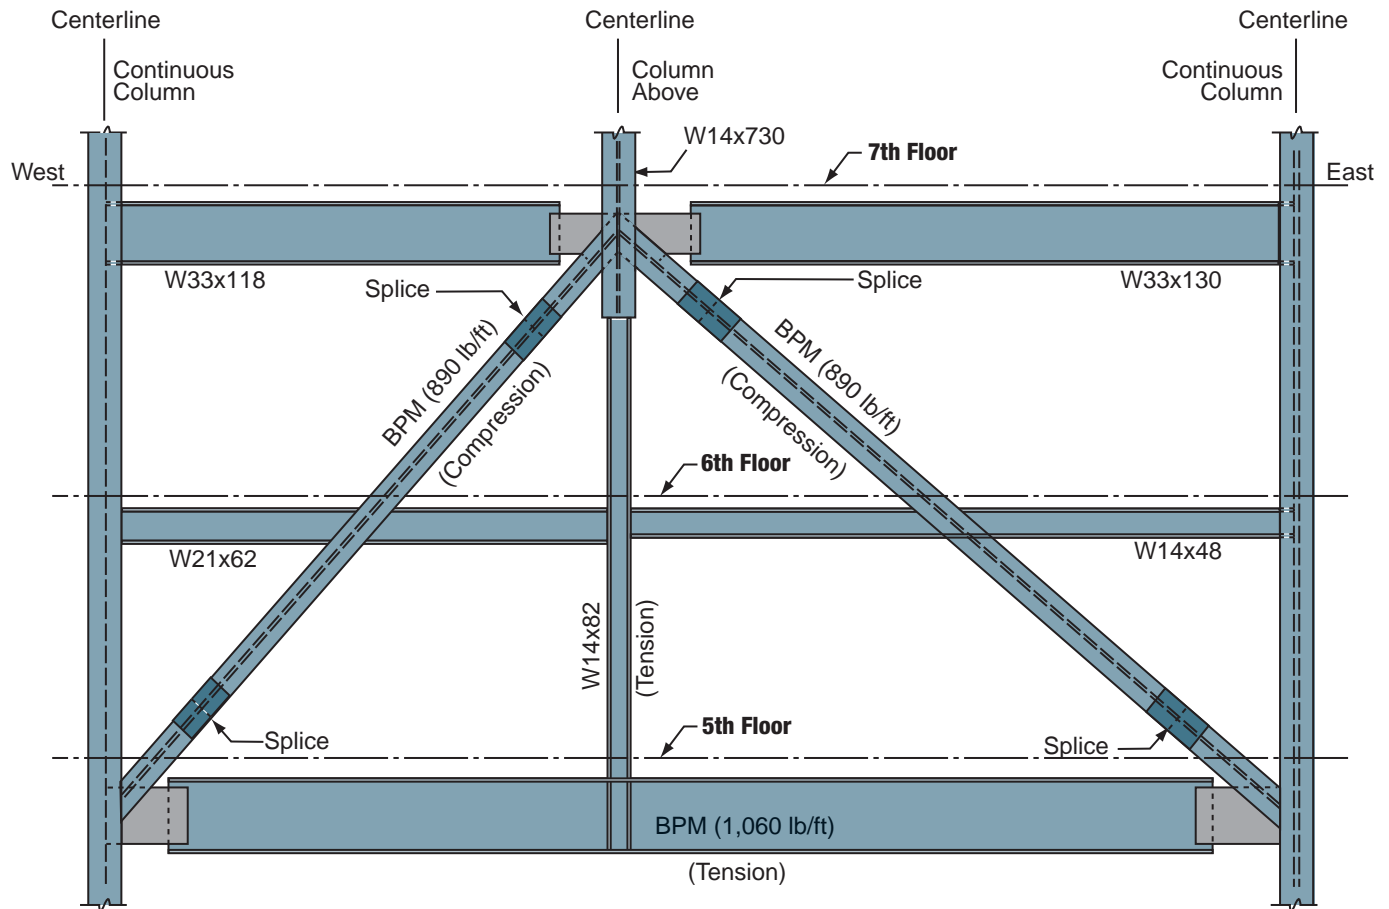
Truss 2 detail. (BPM = built-up plate member.)
